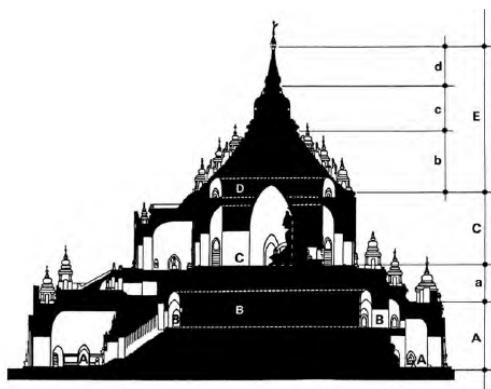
Sectional Elevation of Multi-Storied Temple with a Discontinuous Central Solid Core (Pichard, 1992)
